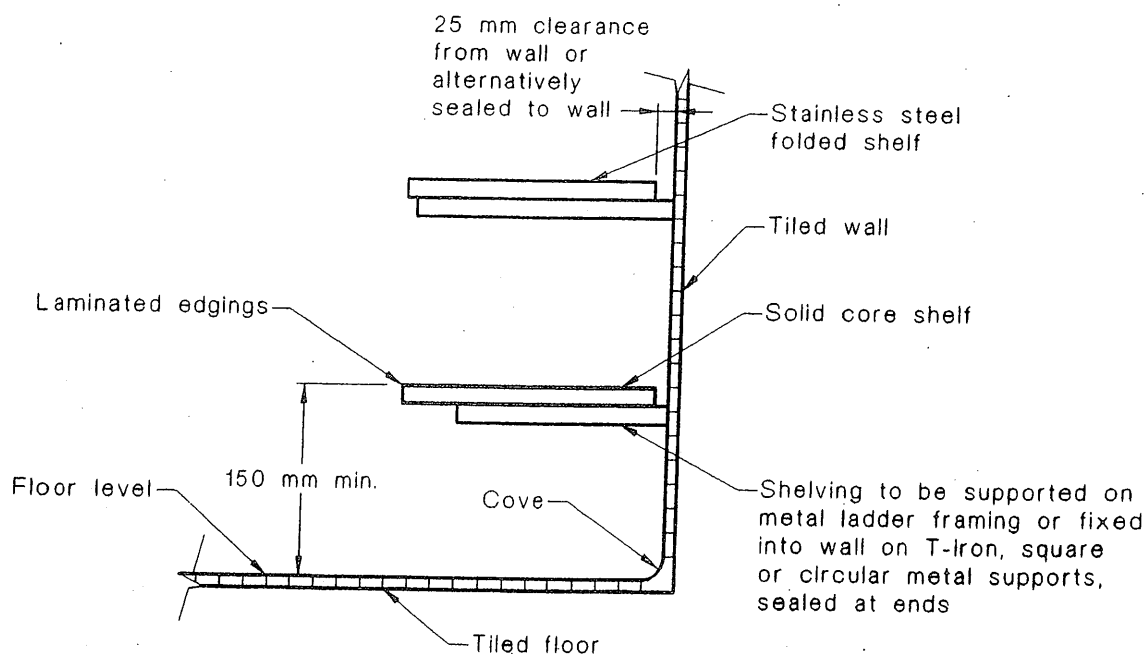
TYPICAL ARRANGEMENT—SHELVING
